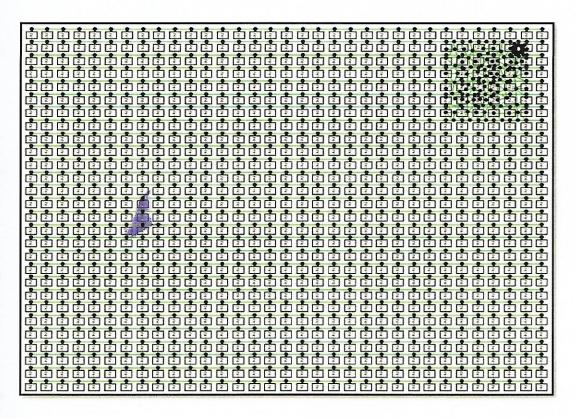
Plan of Model 1 and Model 2 - Rectangular Underground Flood Preventing
